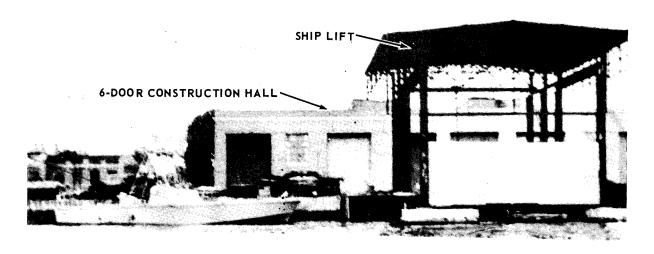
SIX-DOOR CONSTRUCTION HALL AND SHIP LIFT,
